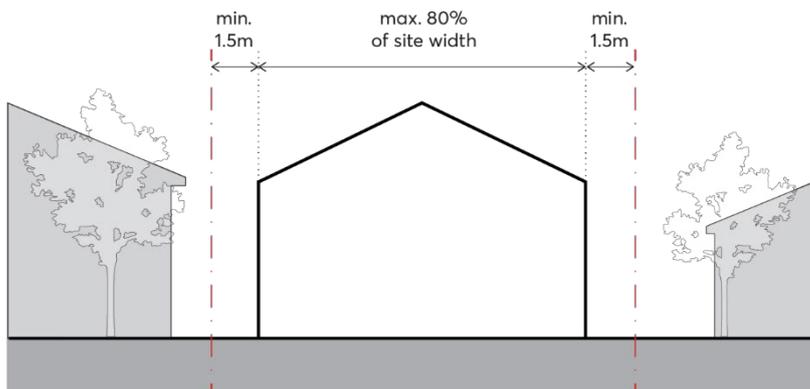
Maximum building width of 80% of the site width
